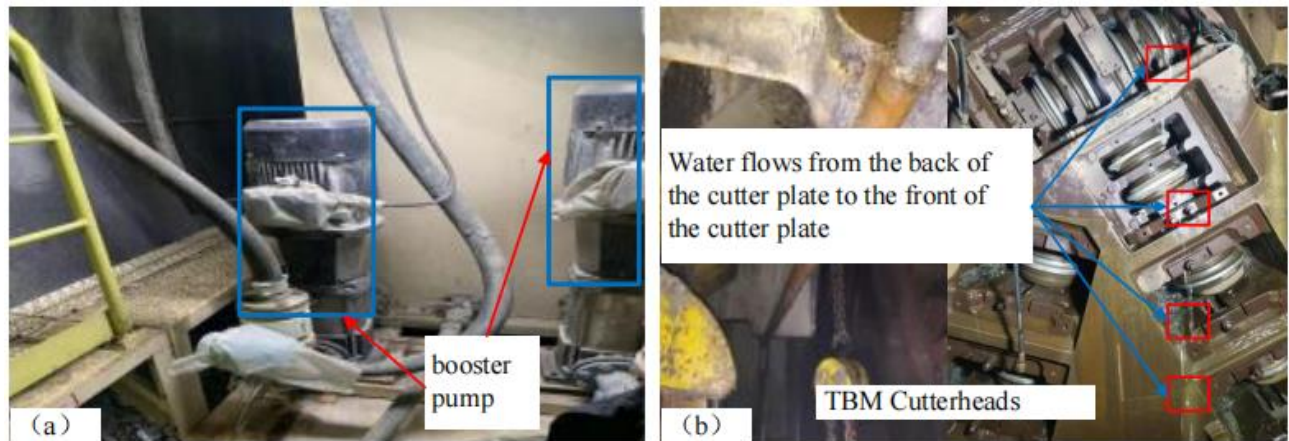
(a) Add a booster pump;(b) TBM cutter head water spray system retrofitted to the back of the cutter head
